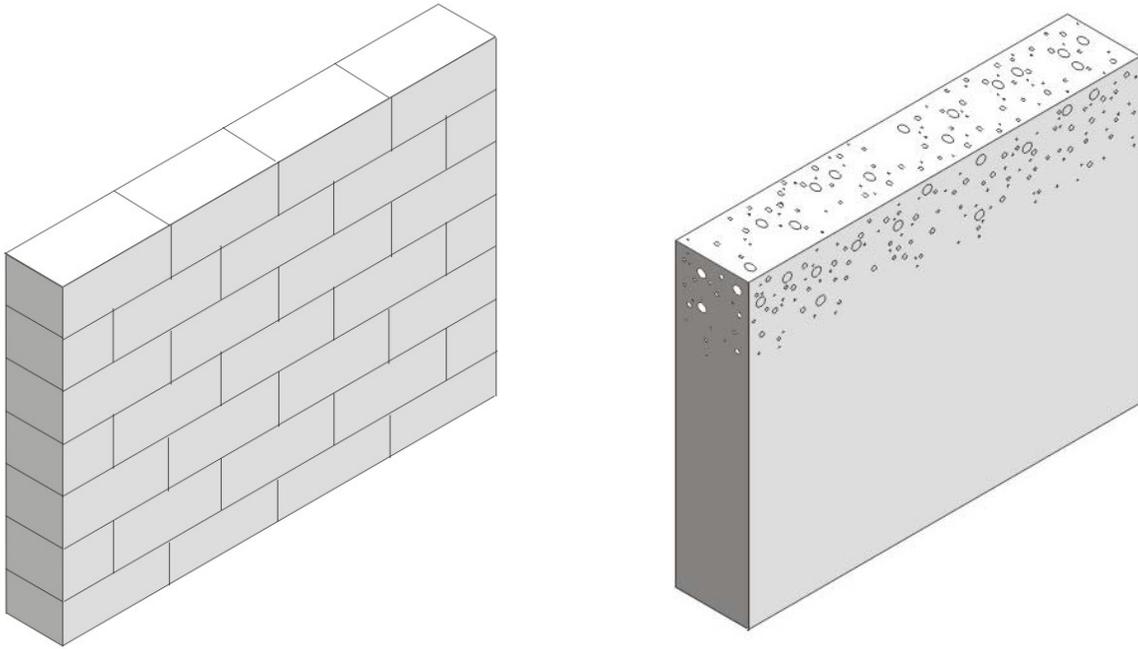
Solid Unit Masonry (left) and Solid Concrete (right) Walls
